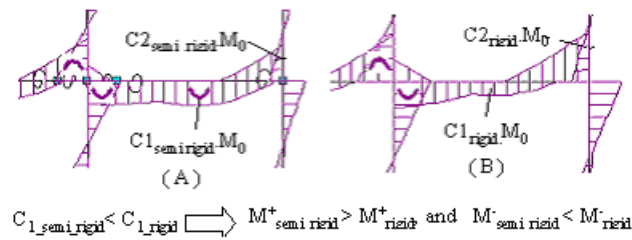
B.M. diagram at a beam in a structure with rigid and semi rigid end fixation
